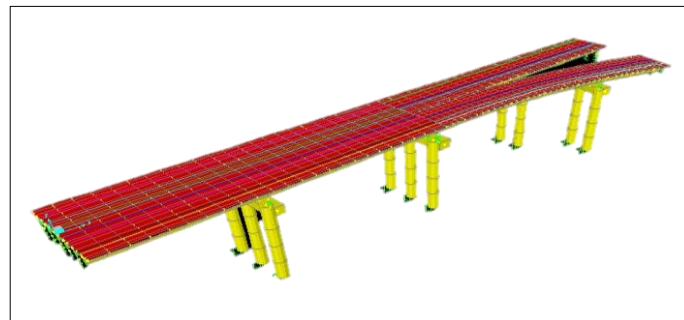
Simple concrete bridges with box beam deck (prefabricated)
